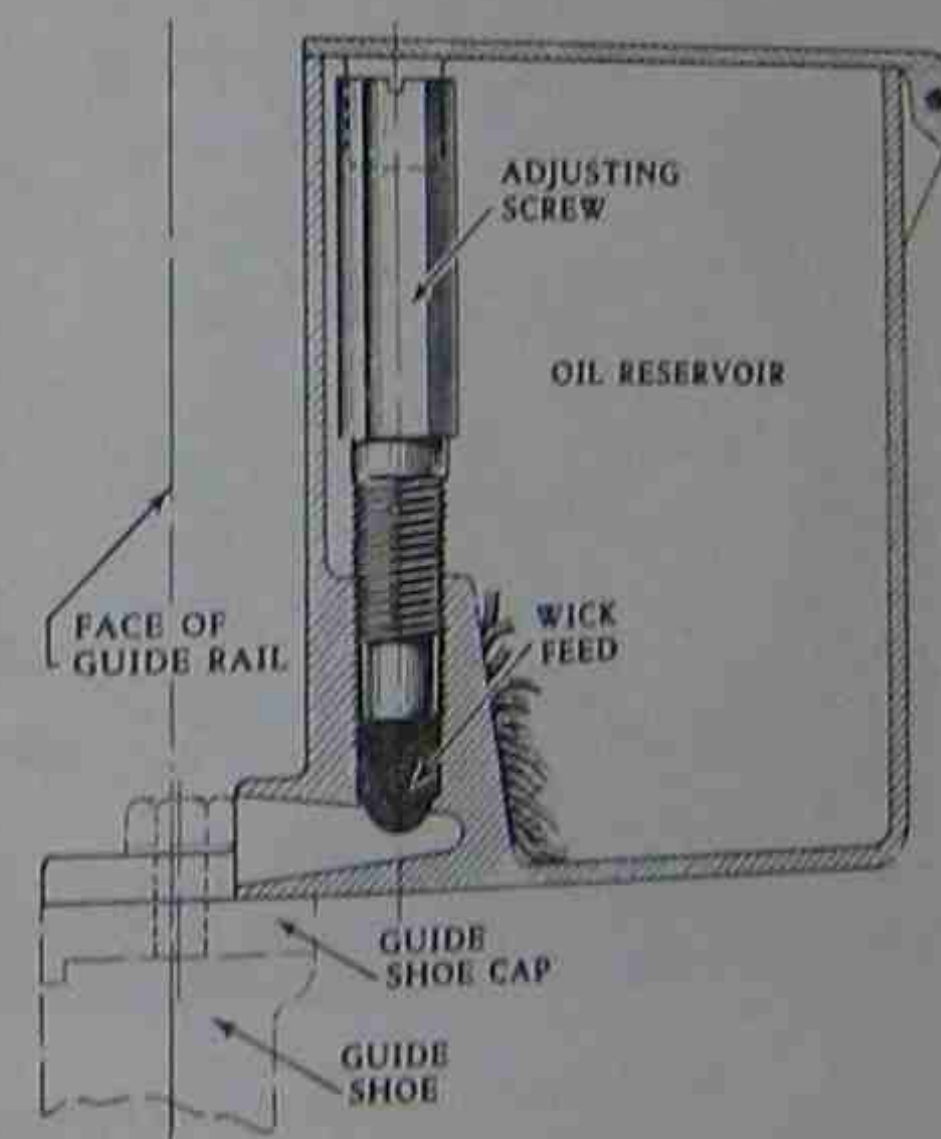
Guide-rail lubricator (Otis Elevator Co.)
